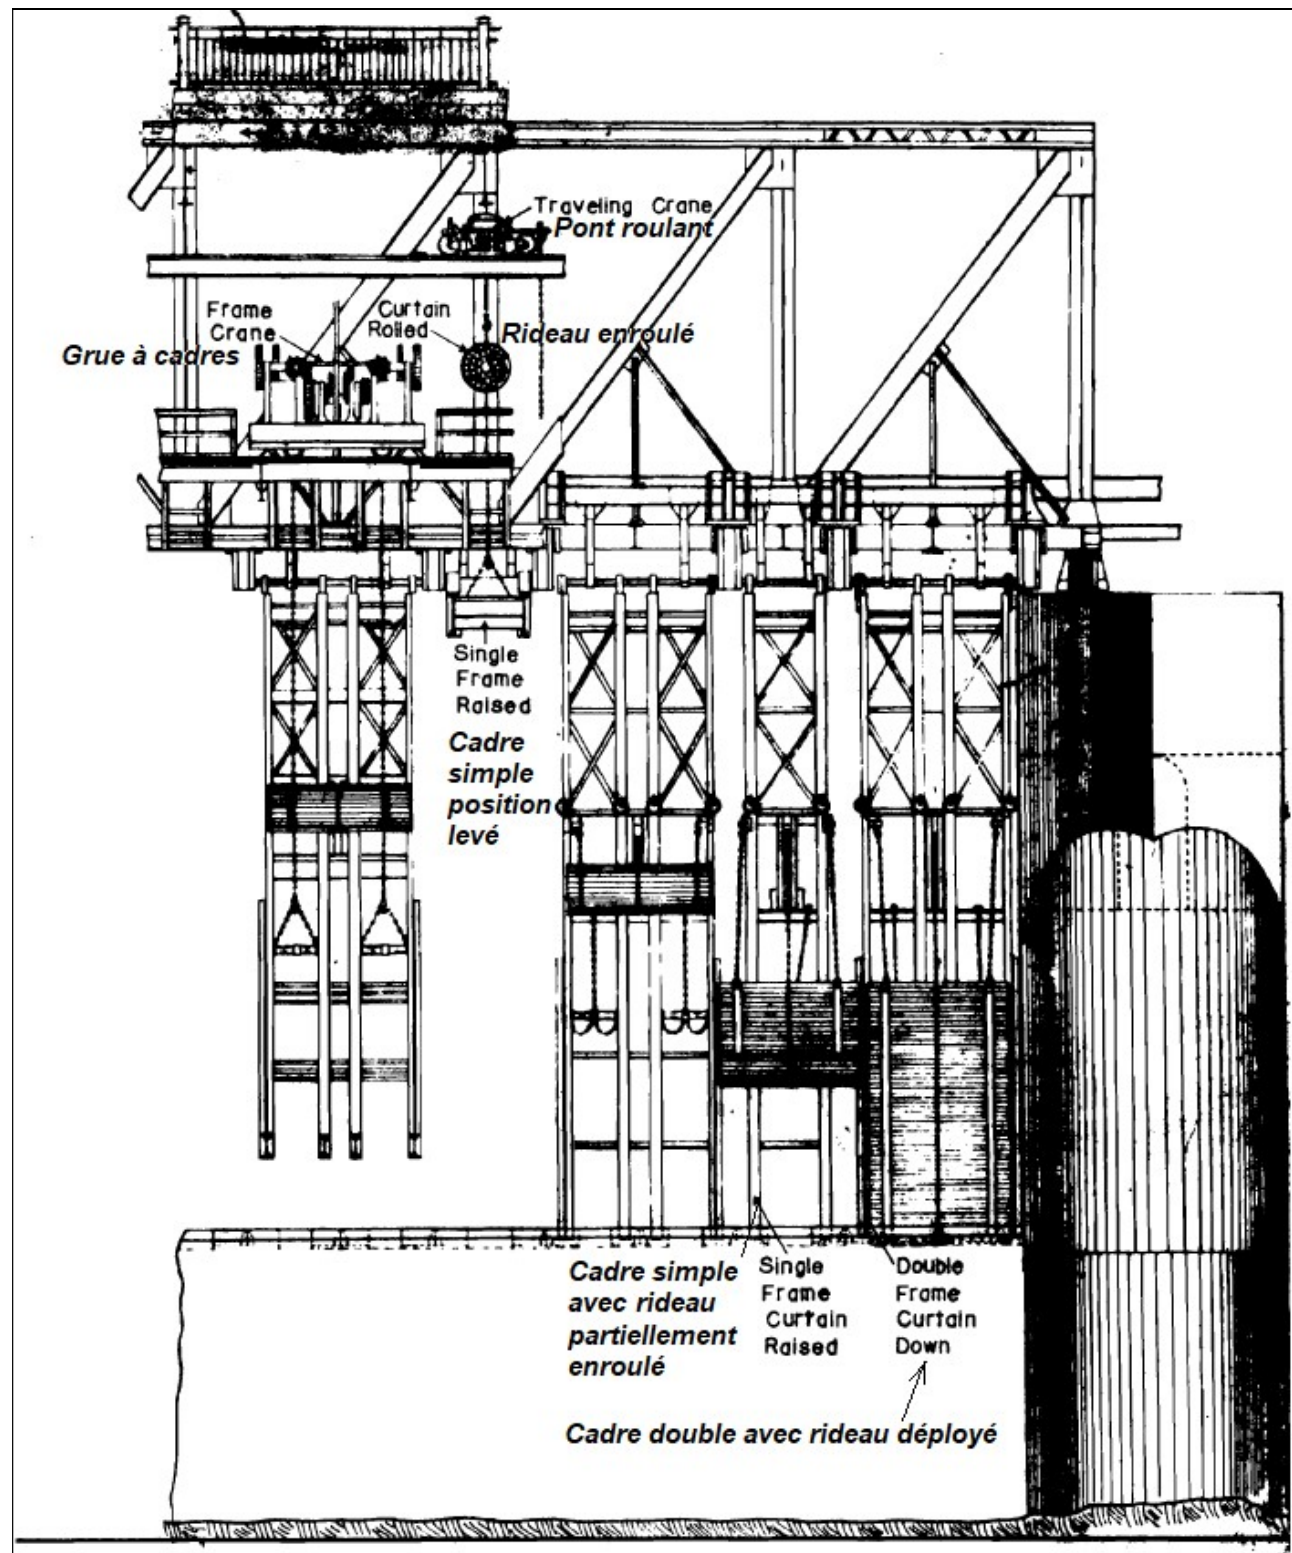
View looking downstream, showing details of moveable dam (i.e. Caméré curtain and frame system). Location of frame crane and overhead crane are shown.
